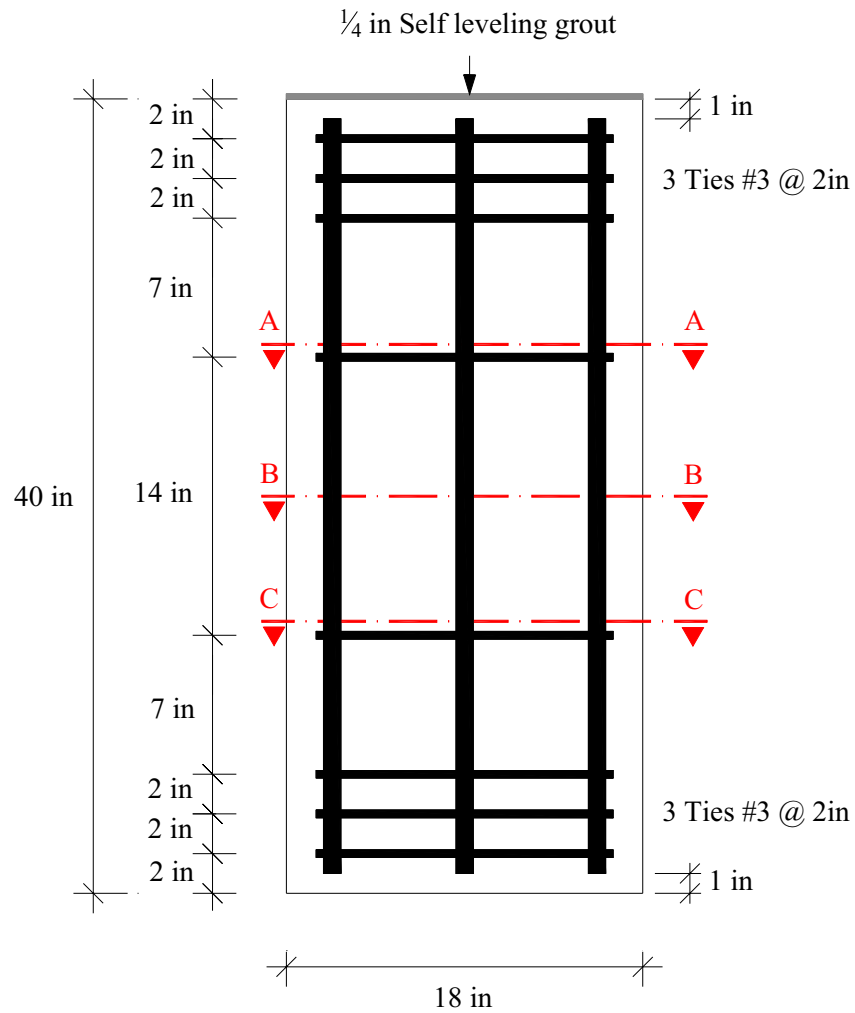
Longitudinal Cross Section; Specimens C1, C2 & C3
